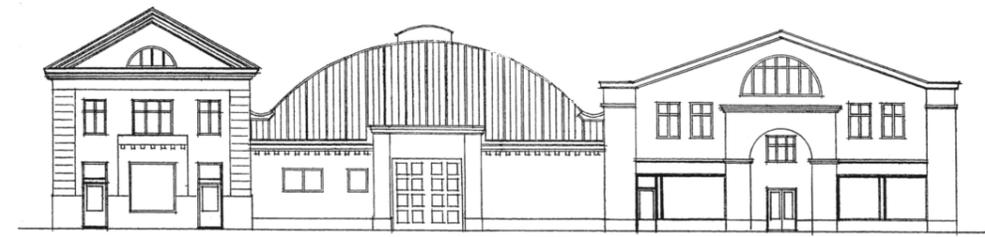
Building permit drawing from 1959. (Wallenstam, 2017. Retrieved with permission.)
